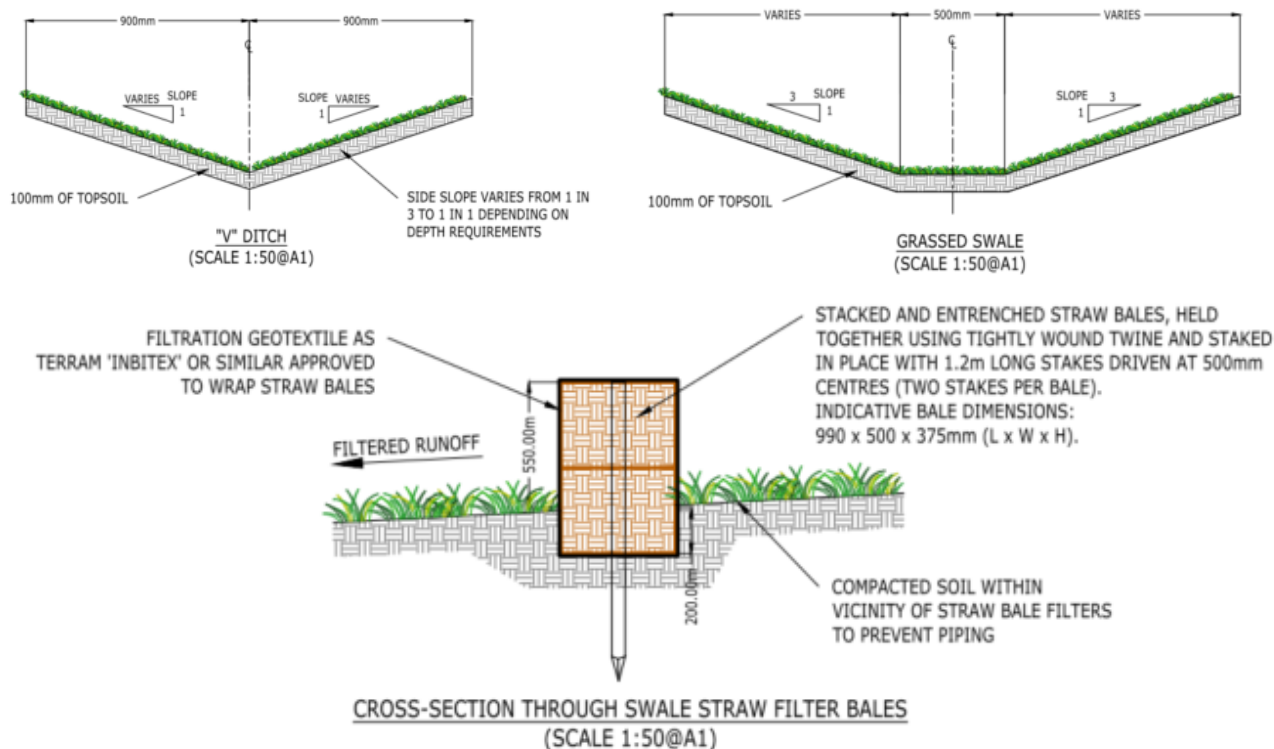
Diagram showing construction of V Shaped Ditches, Swales and Filter Bales
